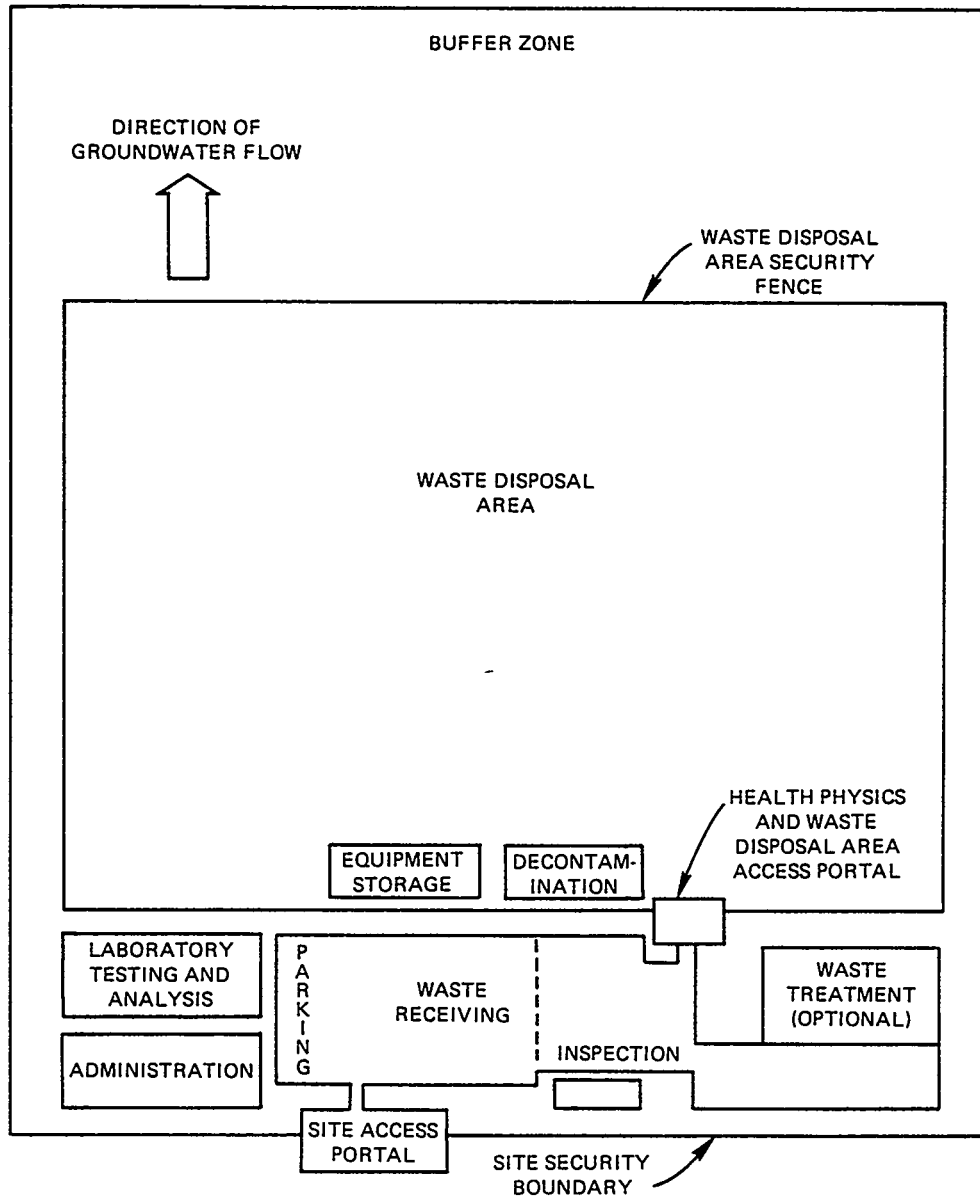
Typical plot plan for a shallow land burial facility (not to scale).
